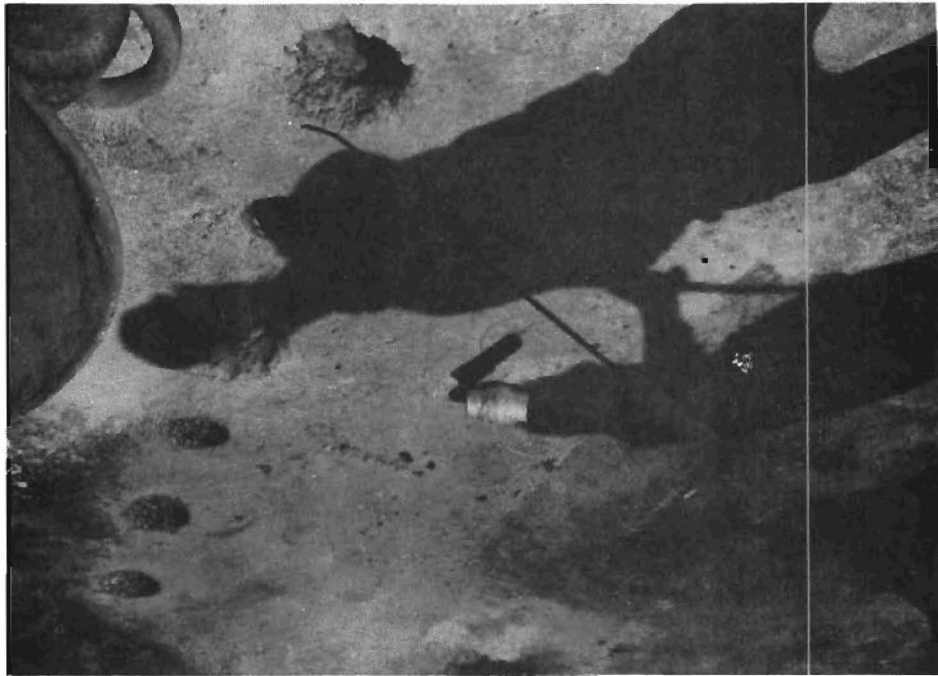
Placing steel rods into the holes and anchoring them to the bottom.
